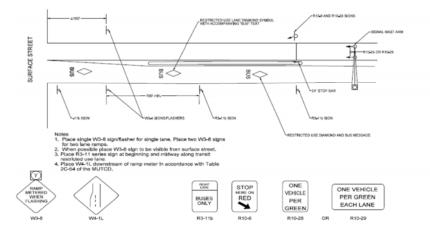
Single Lane Loop Ramp Meter Signing and Pavement Markings
